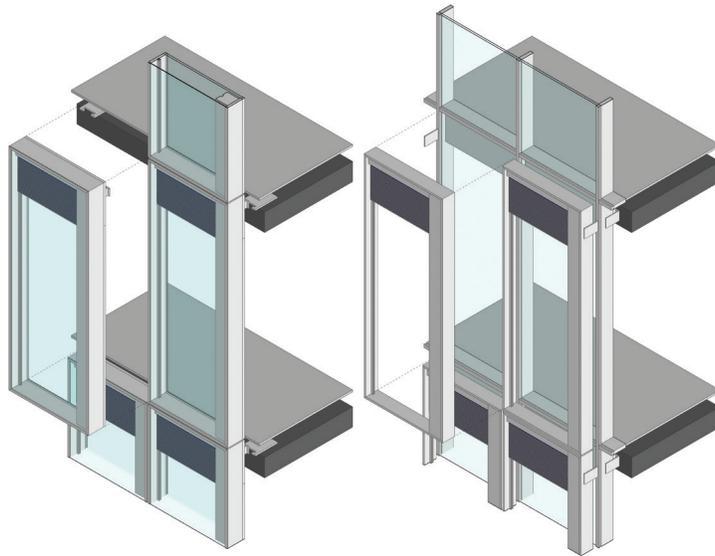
STVB installation in Scenario 2 as part of double skin unitised façade (left); as an additional stand-alone element on an existing unitised or stick façade system (right)
